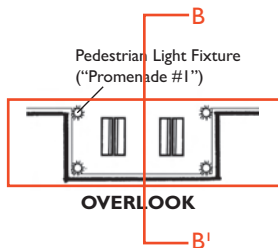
C.6: Plan of Proposed Promenade Overlook (Option 2)
